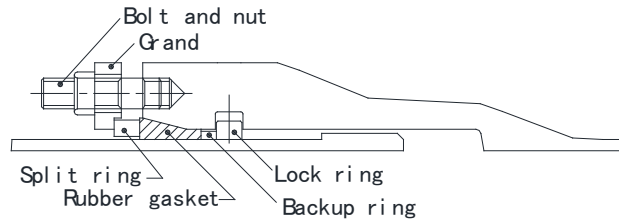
Joint structure of Type S pipe joint (DN1100~2600) (Source: JDPa)
